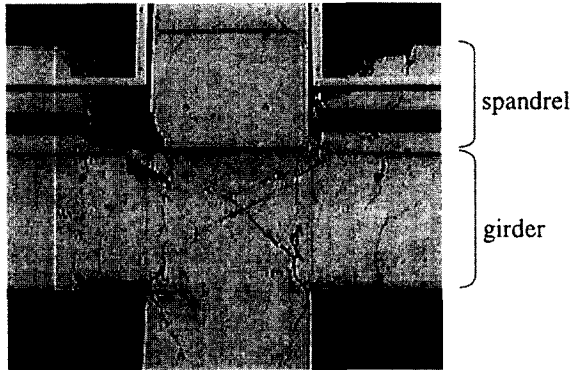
Column-girder connections in frame X_1 Photo. 4 Column-girder connections in frame X_2
